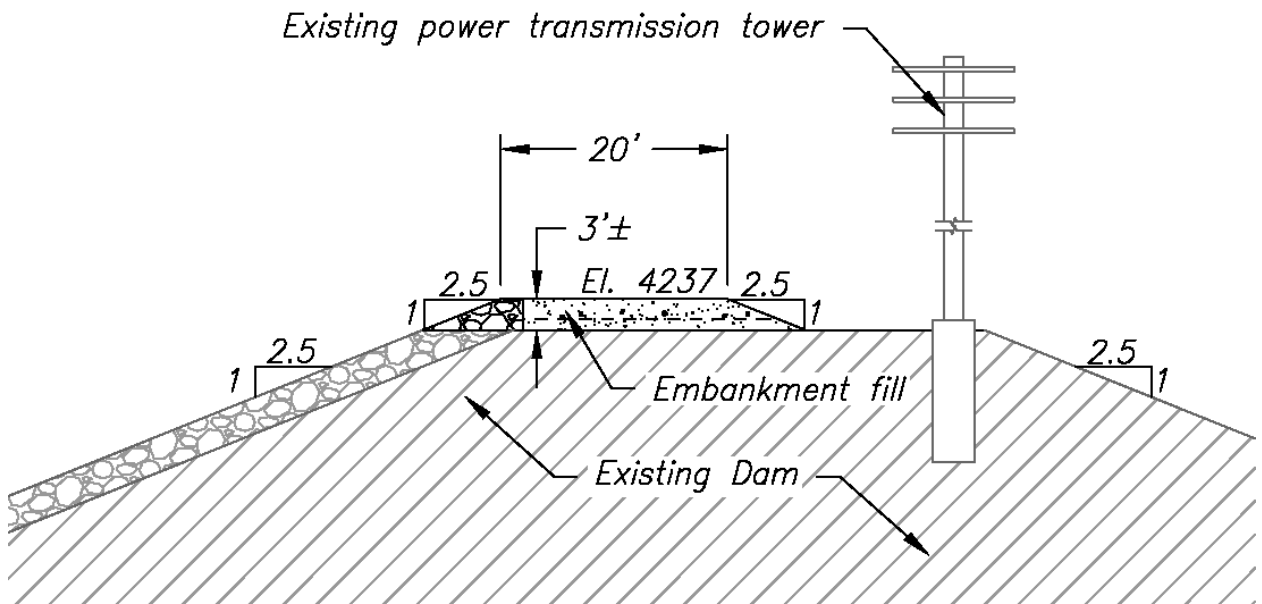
Typical cross section of crest raise from Station 700+00 to 810+00.
